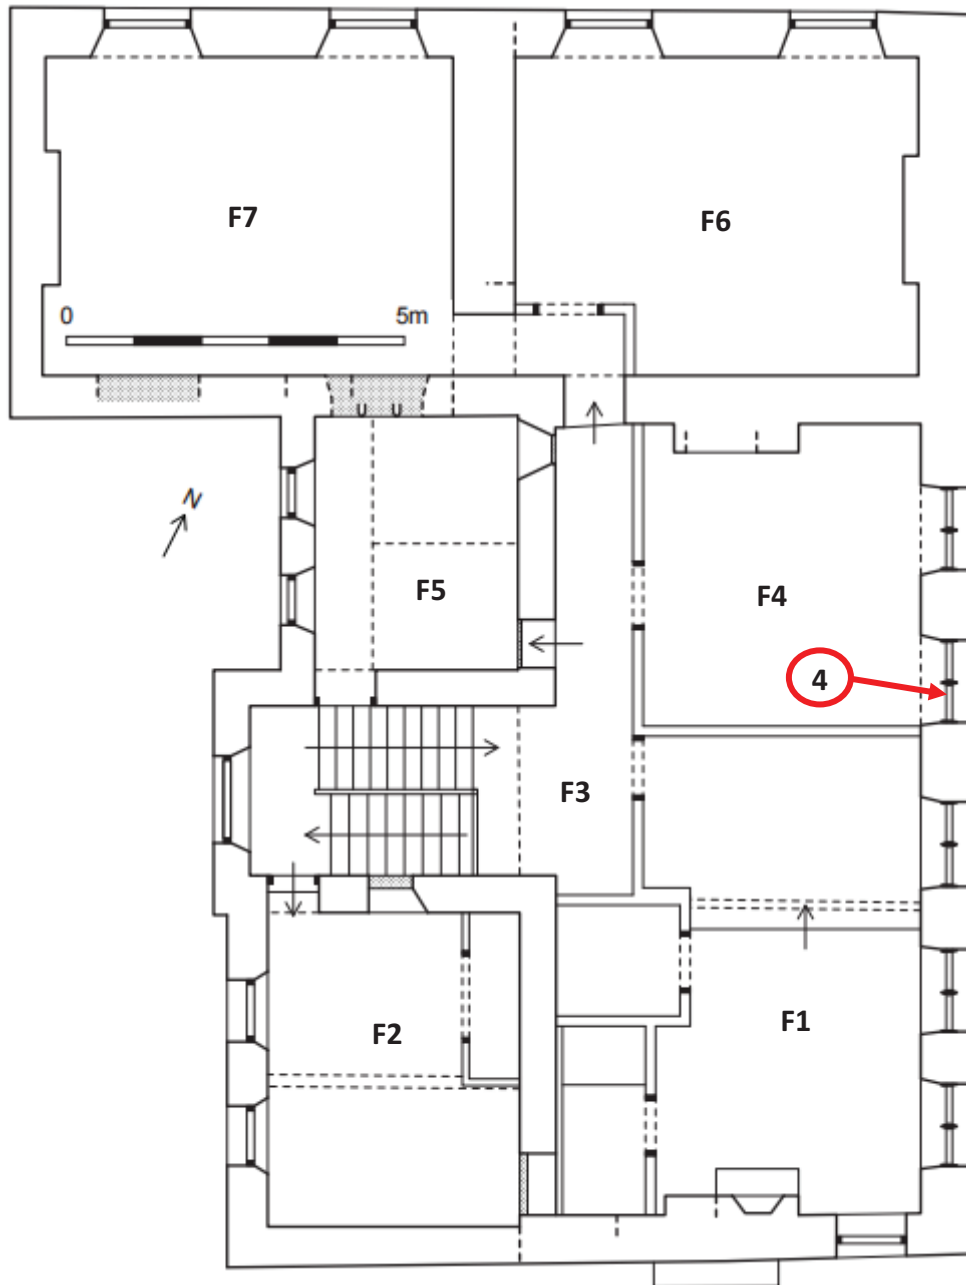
Plan of first floor rooms to help locate sampled timber (see Table 1) (after Greenlane Archaeology Ltd)
